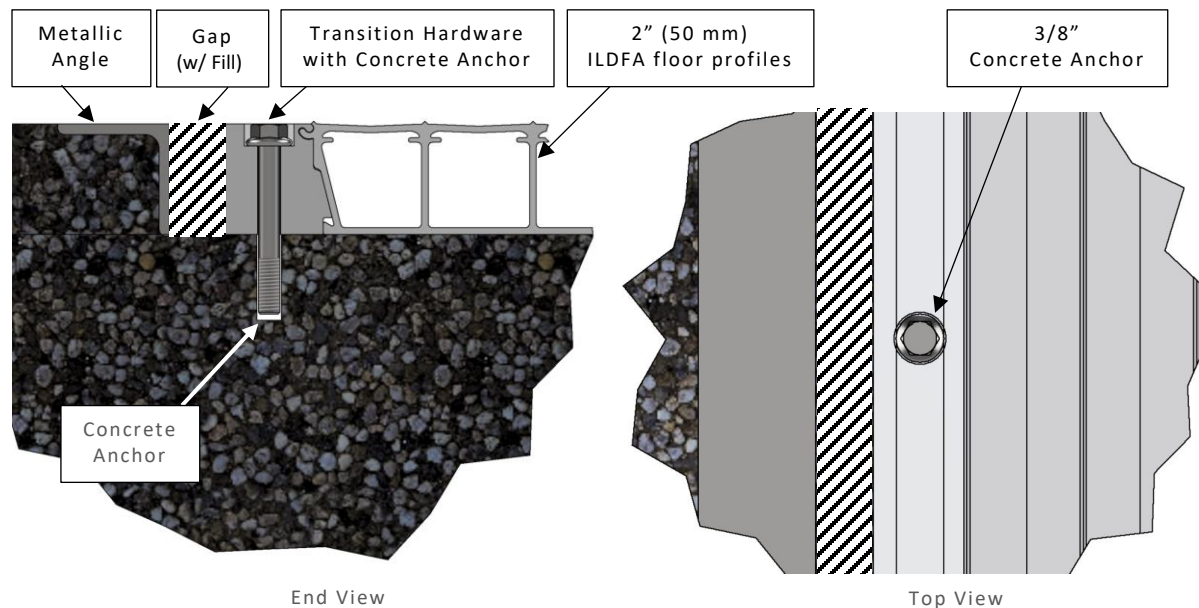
Transition from Hangar Slab to ILDFA with Recessed Concrete
